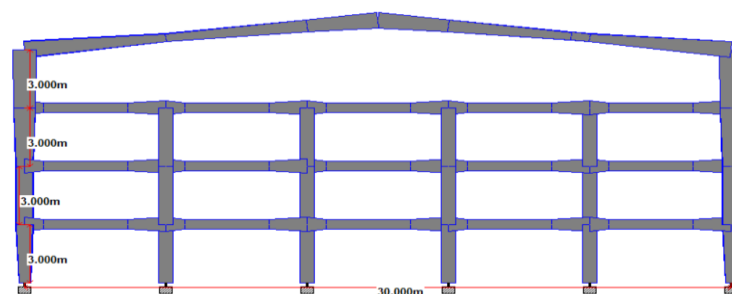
Section of Pre-Engineered Building as per IS 800:2007 (LSM).
